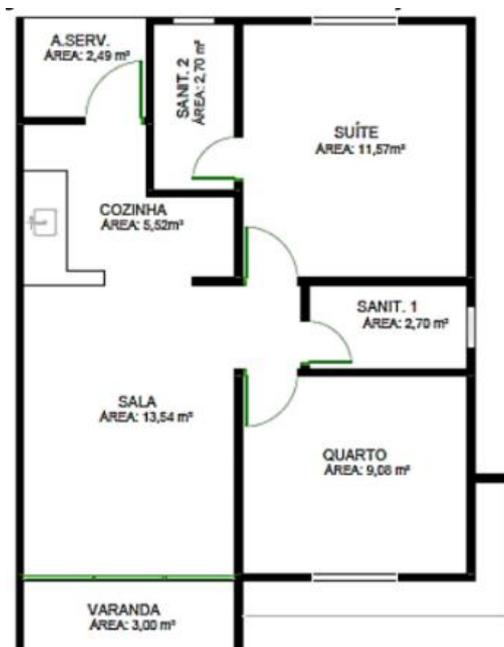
Floor plan of the evaluated dwelling (Source: Paulo Afonso, 2021.)
